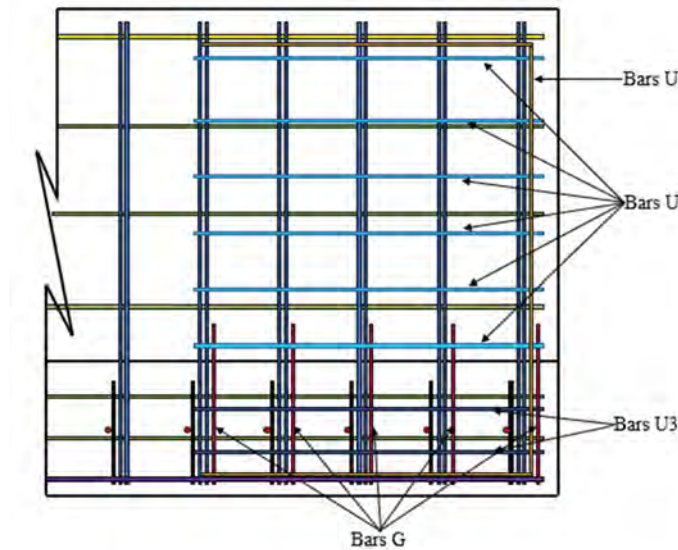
End Face Elevation View of 60 Degrees ITBC
